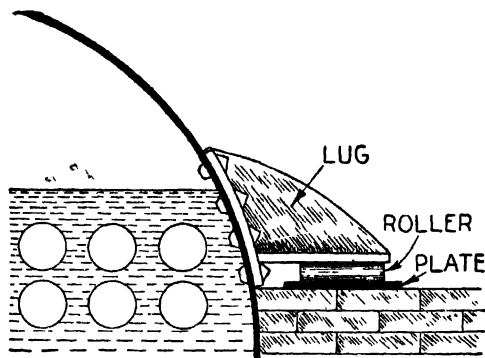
,385.—The usual but objectionable method of providing for expansion on lug supports of boilers. *It will be seen* that no provision is made for transverse expansion of the shell, consequently the sidewalls must "breathe" with the boiler, which tends to produce air leaks by cracking and loosening the mortar.
